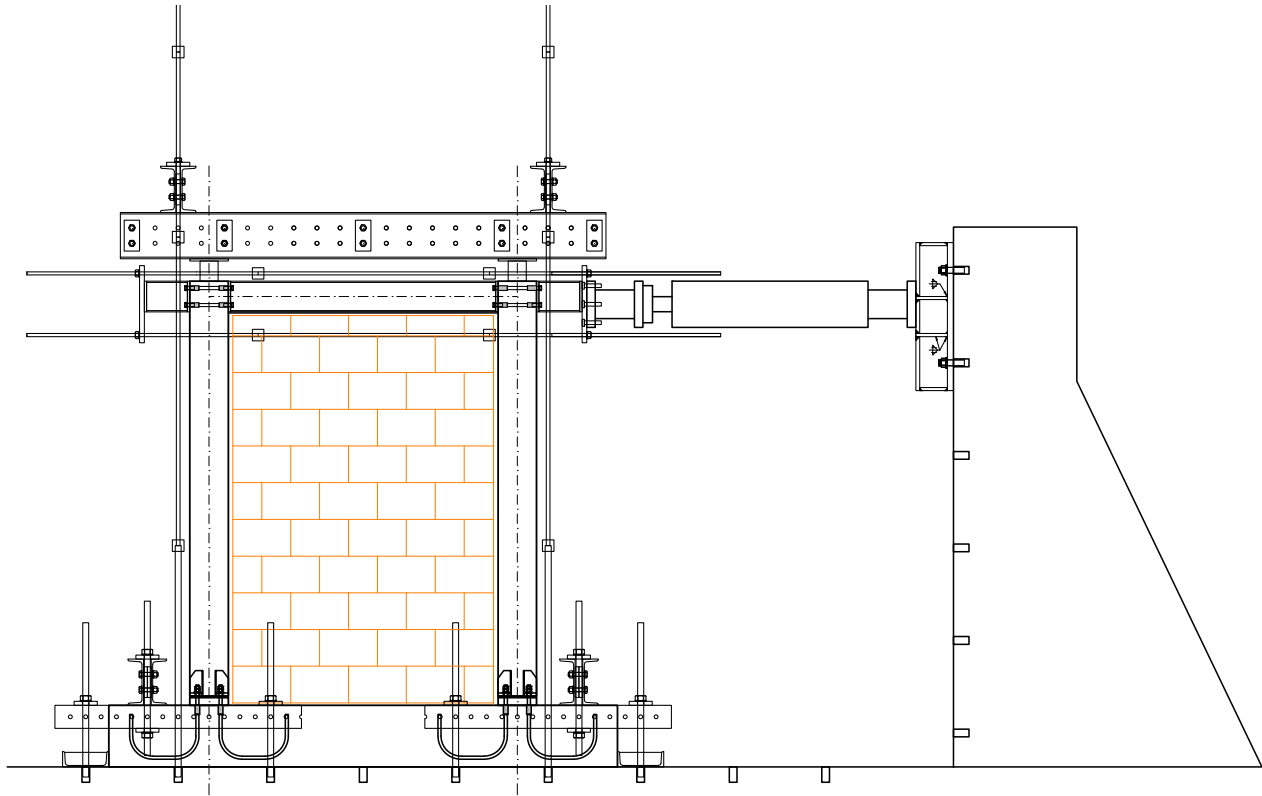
Test setup for RC-steel frame with brick infill prototype
